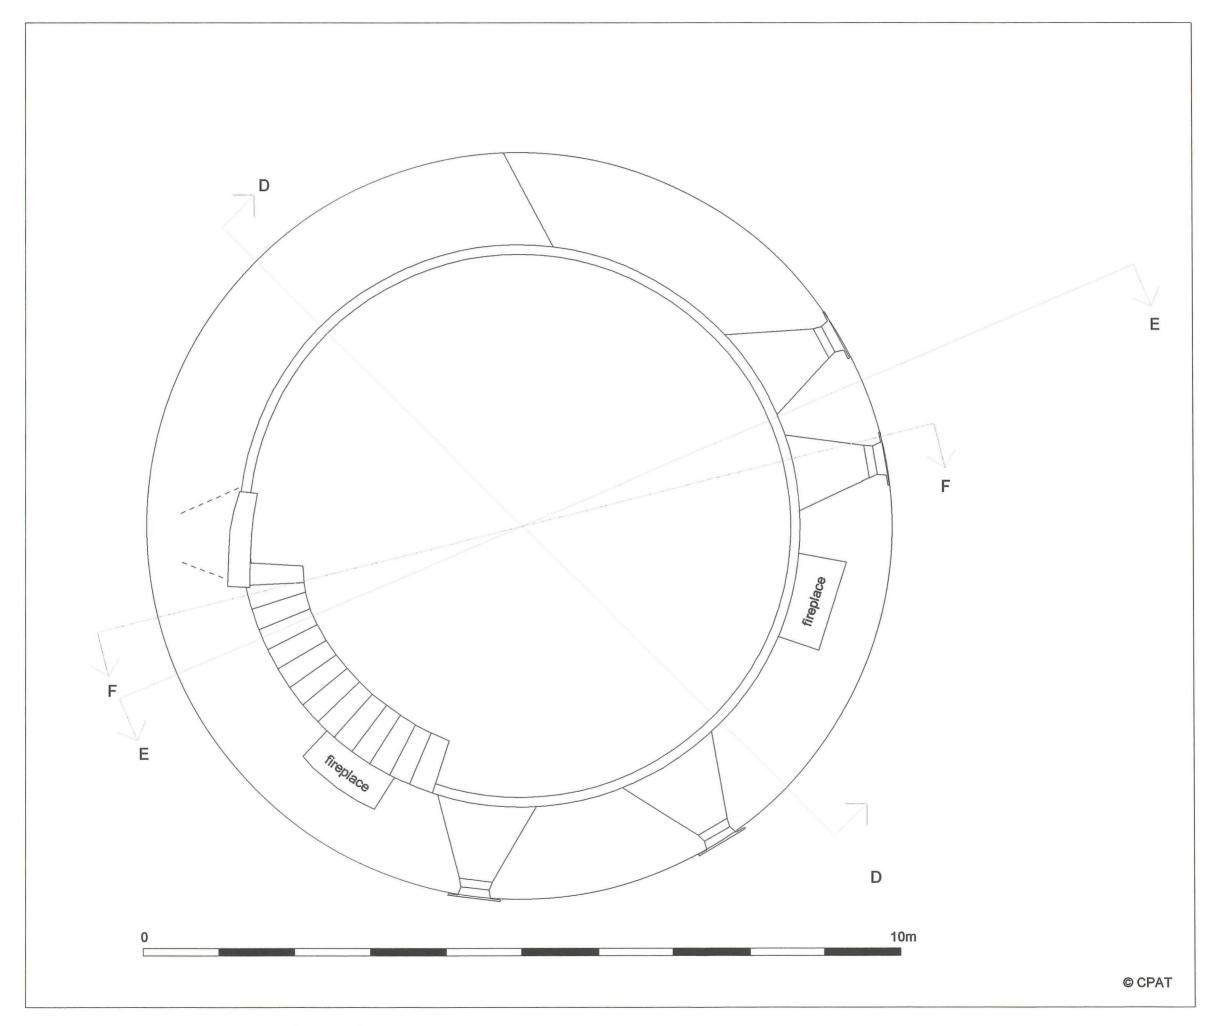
Roundhouse Farm south-west tower, first floor plan
